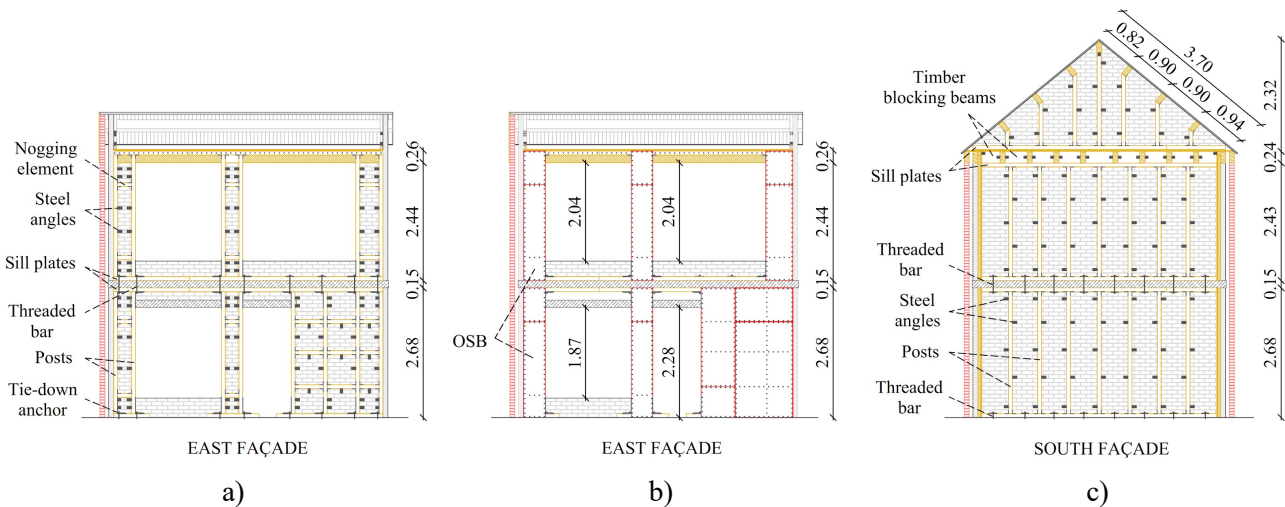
Retrofitted specimen elevations: a) timber frames applied to longitudinal façades; b) OSB nailed to frames on longitudinal façades; c) timber frames applied to transverse façades. Units of m.
